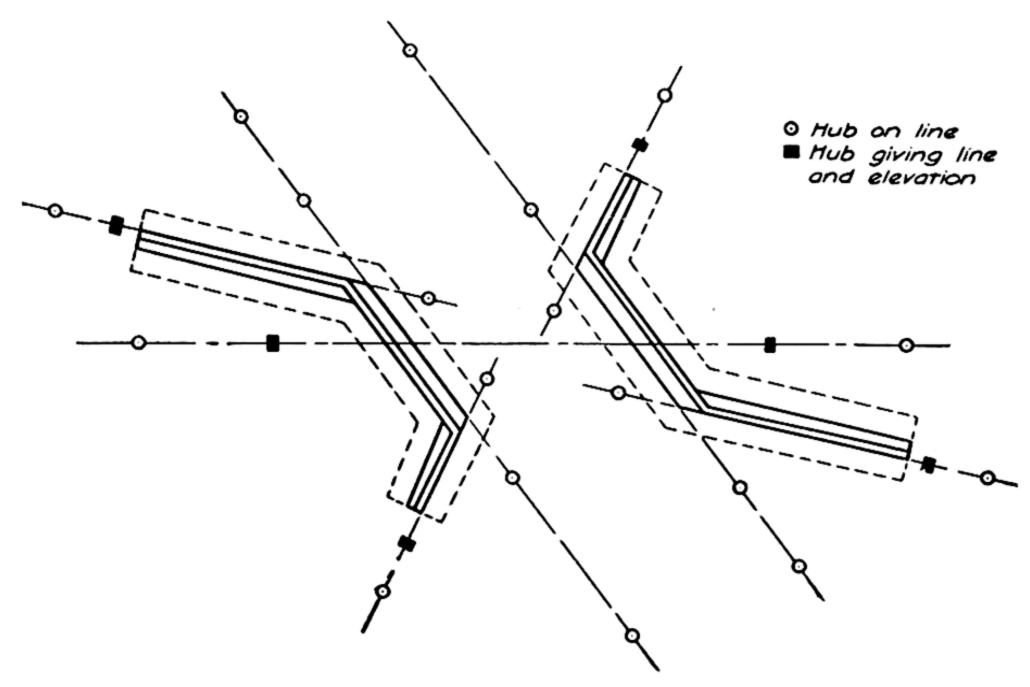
Illustrating a method of setting stakes for culvert construction.
